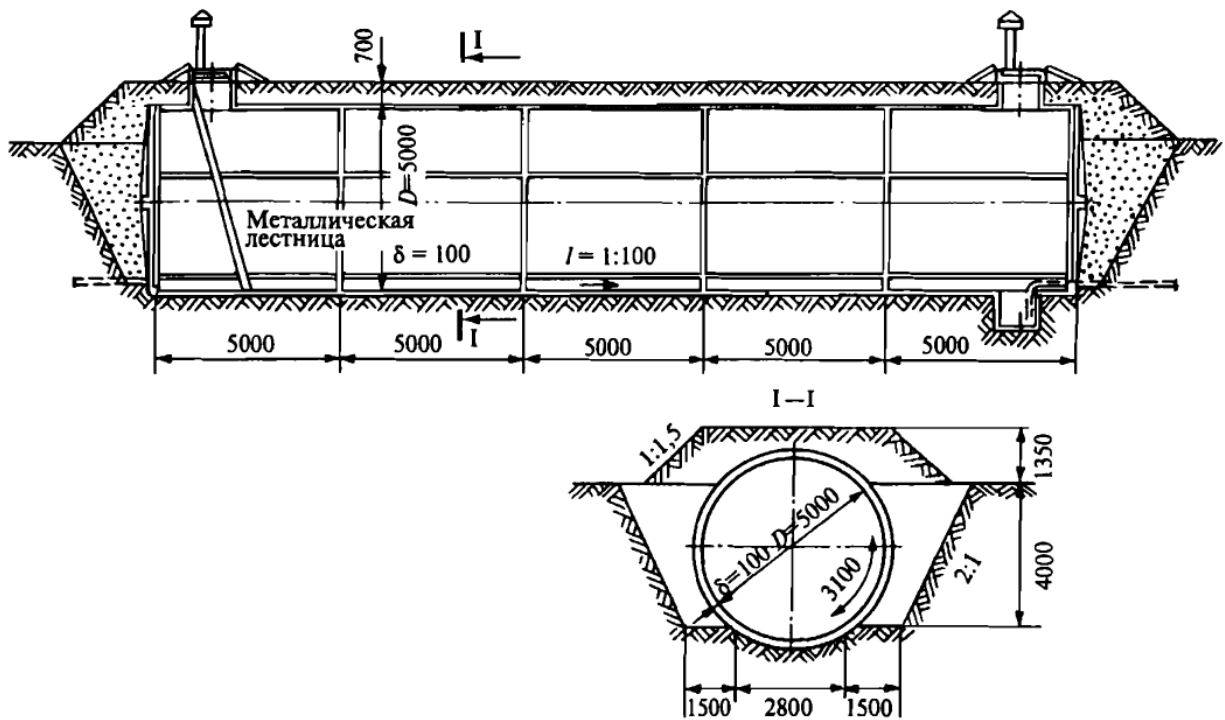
Precast reinforced concrete horizontal buried tank with a capacity of 500 cubic meters
